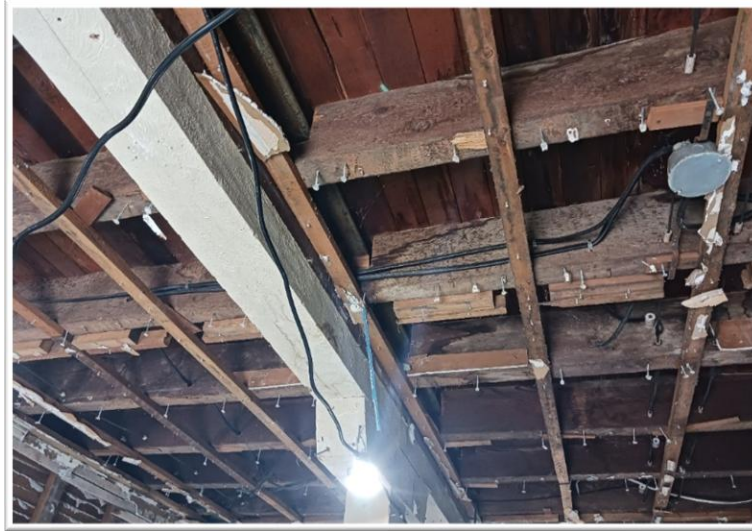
Compromised Joists Due to Top Cuts for Plumbing Installation
